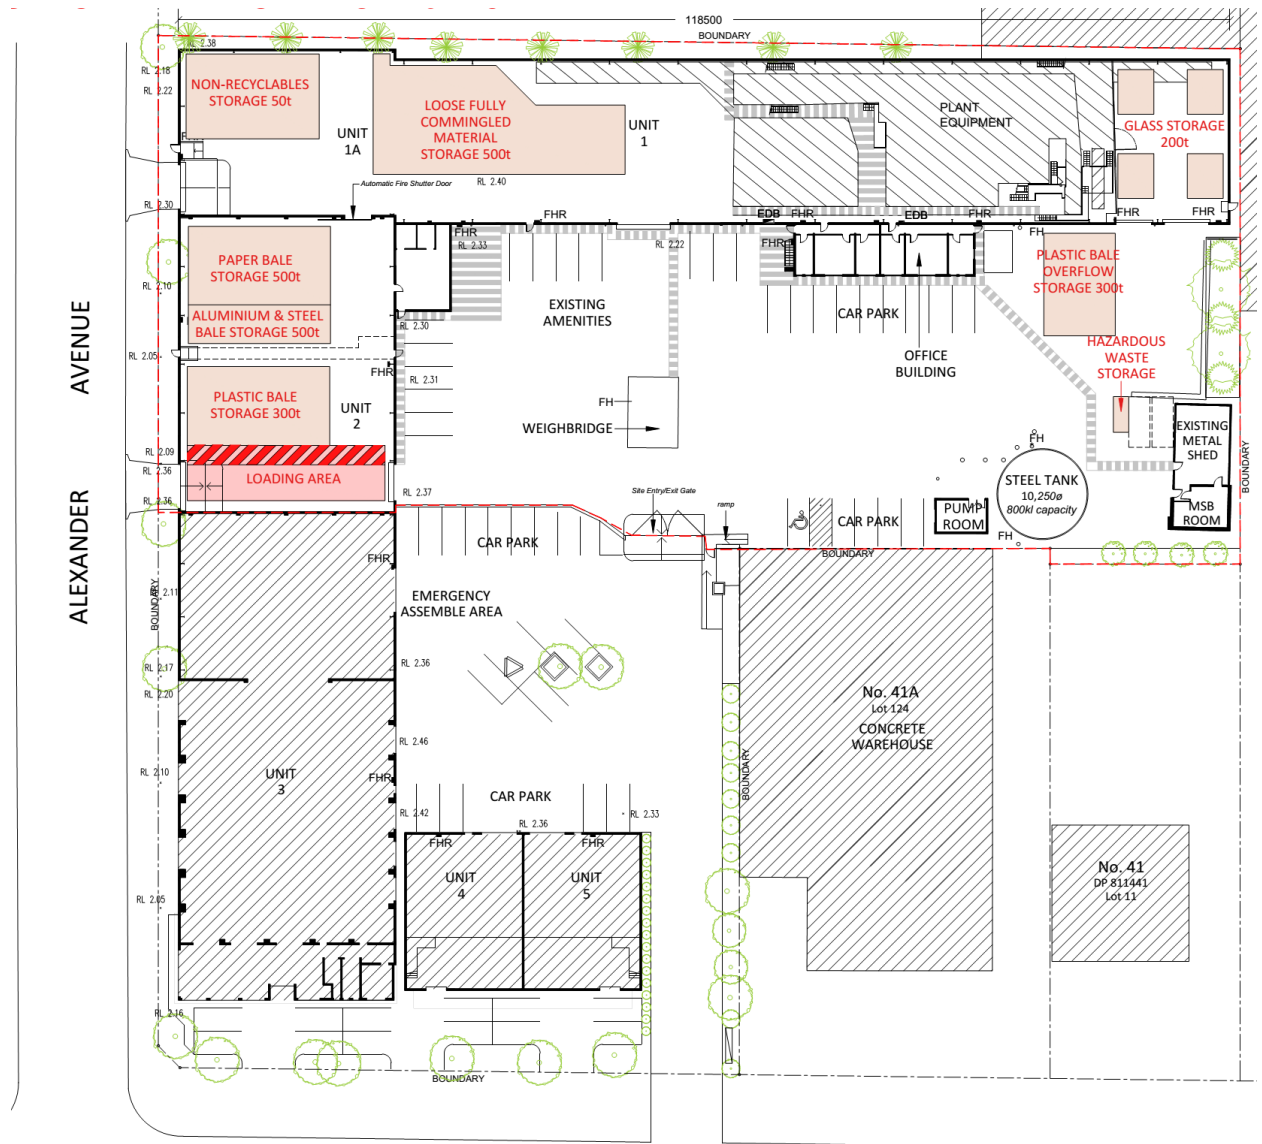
Visy Resource Recovery Facility - Site Layout
